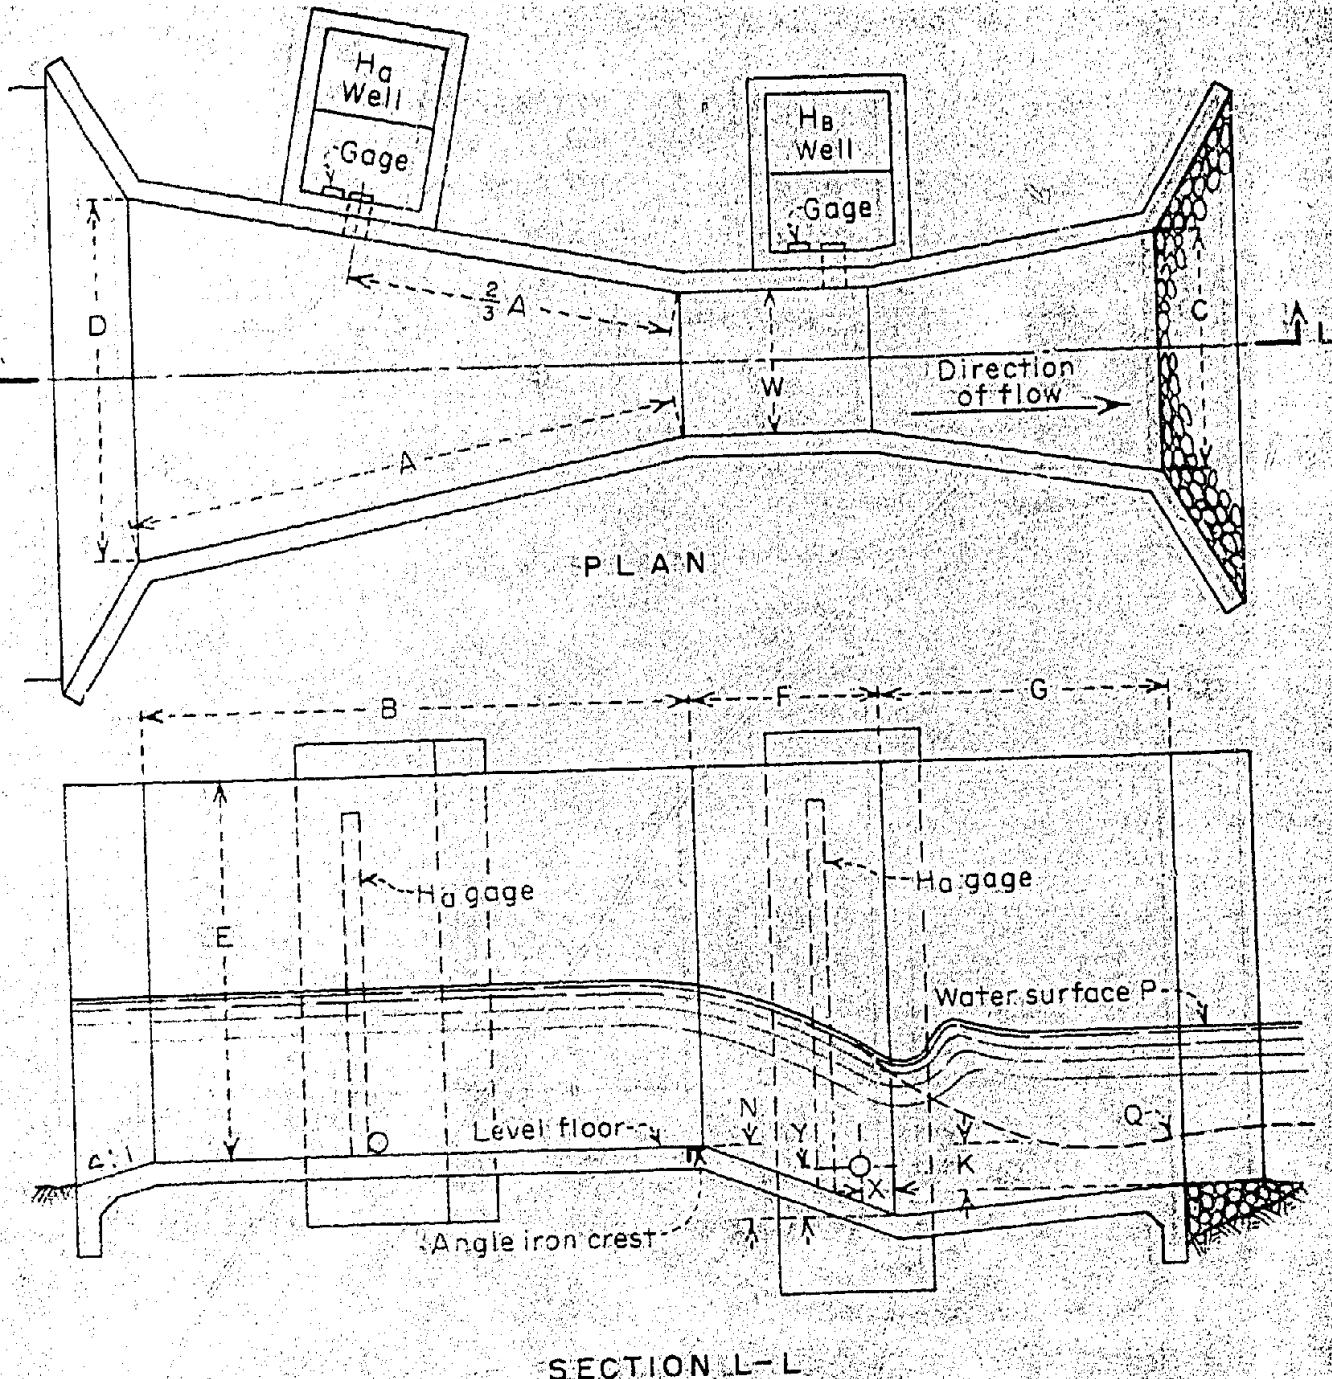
Plan and elevation of the Parshall flume, 3, 6 and 9 inch sizes.
